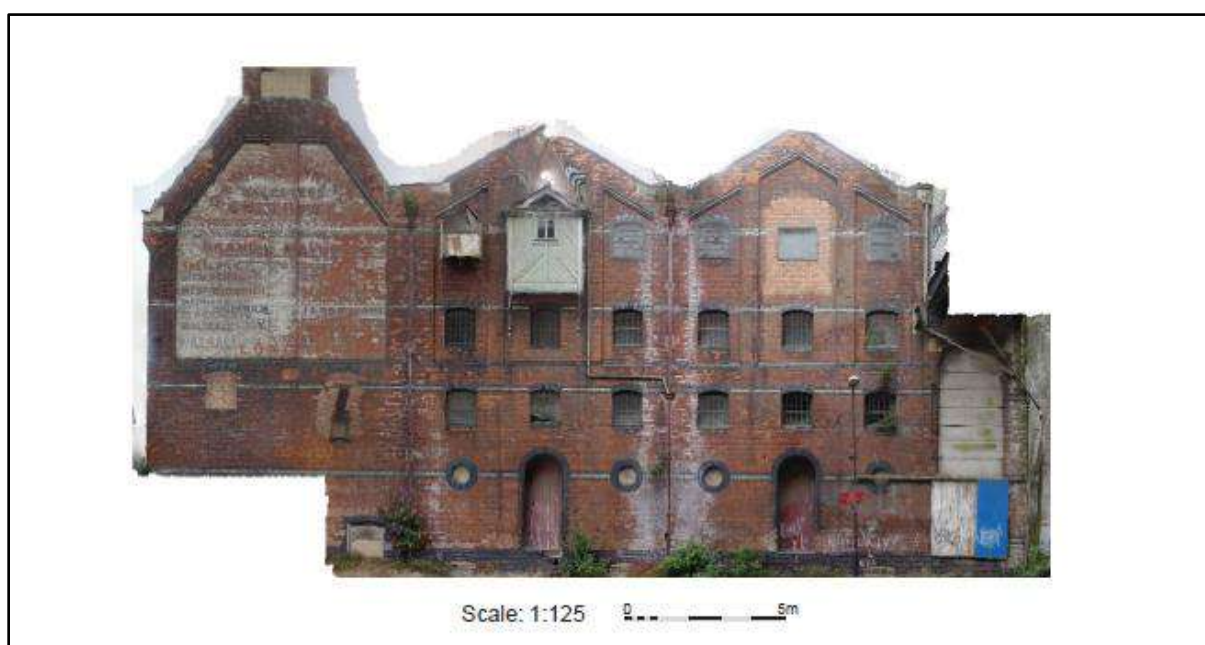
Photogrammetric rendition of the western elevation of Malthouse 2 and Kiln (far left; reproduced from the 2018 Final Report, where it is provided at scale)
